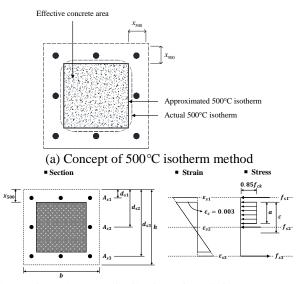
Strength degradations of a reinforced concrete column due to fire damage
